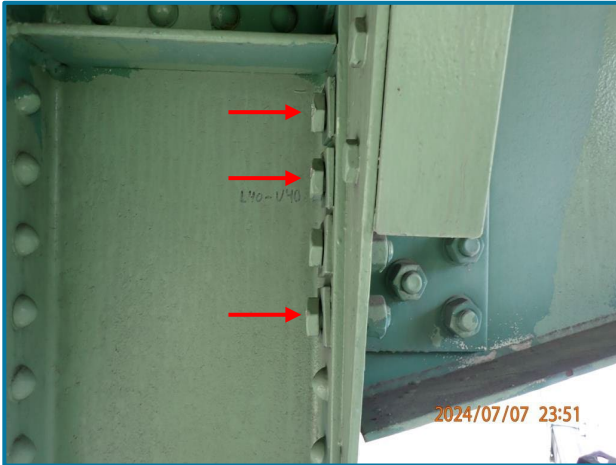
Three bolts not properly snug (U40 of the North Truss, Span 9).
